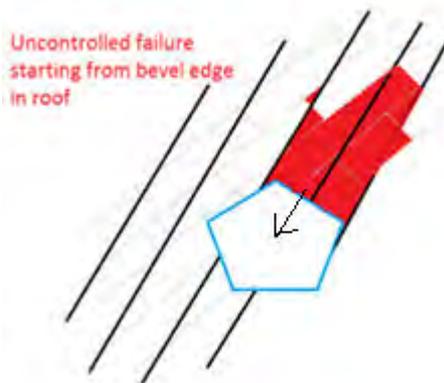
Unplanned roof fall, due to initial failure of “bevelled” bedding / cleavage intersection
